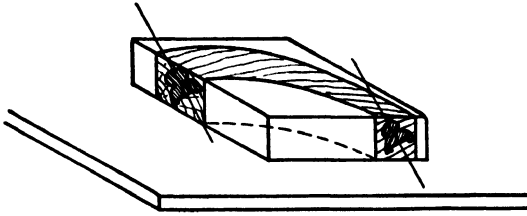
Plank on which Face Mold Is Marked Out, Lying Flat
